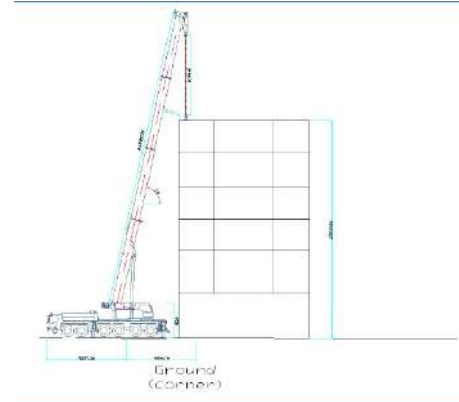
View of the crane in the lifting position of Plan No. 1 to pick up the concrete piece closest to the silo.
